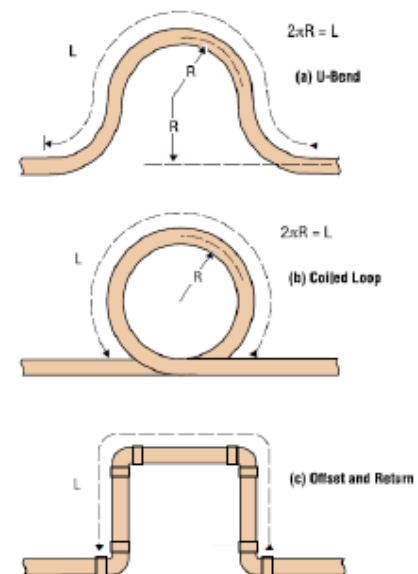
(Above) – Expansion Loop Dimensions, “The Copper Tube Handbook”
